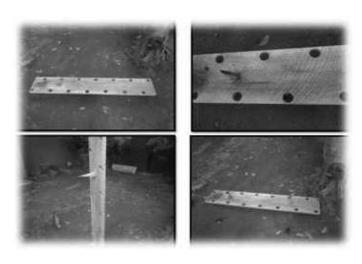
Planting pad used to plant pegs of Glyricedia for better soil (slope stability)
